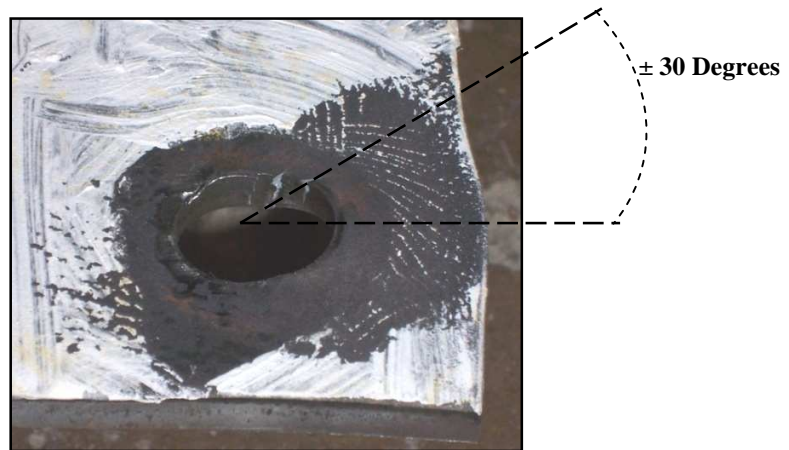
Bottom Hole Condition of Specimen 4STR2 Shear Plate.
